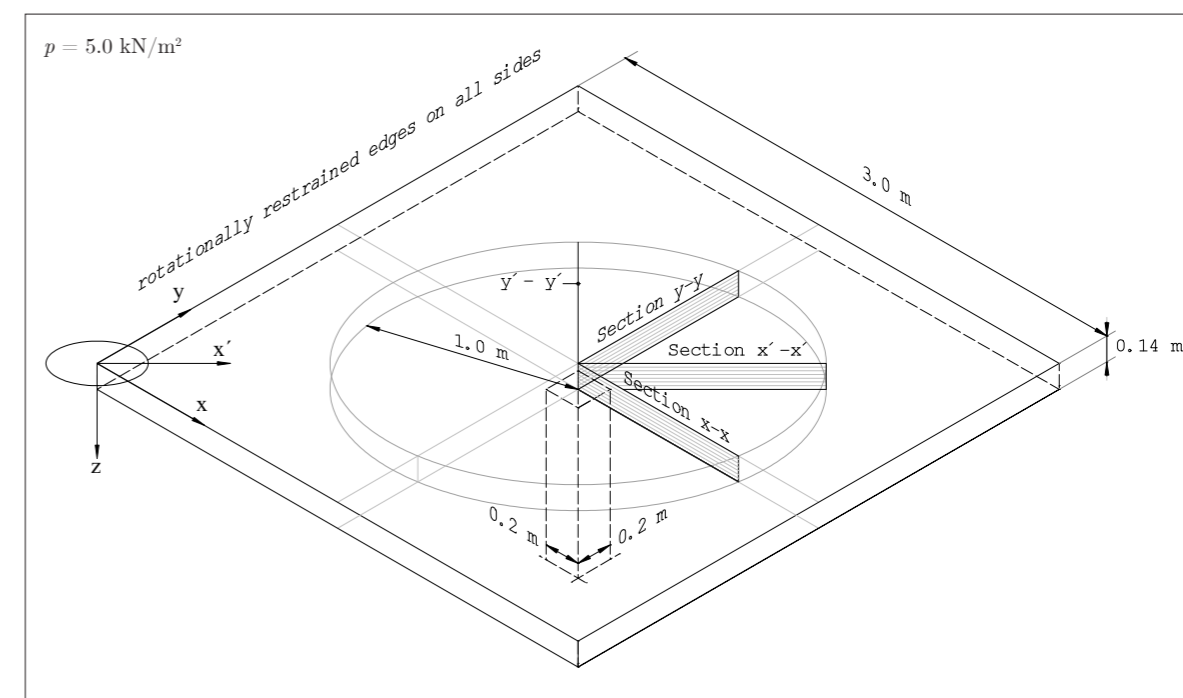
Circular and longitudinal design sections within the centric point-supported mass timber slab
